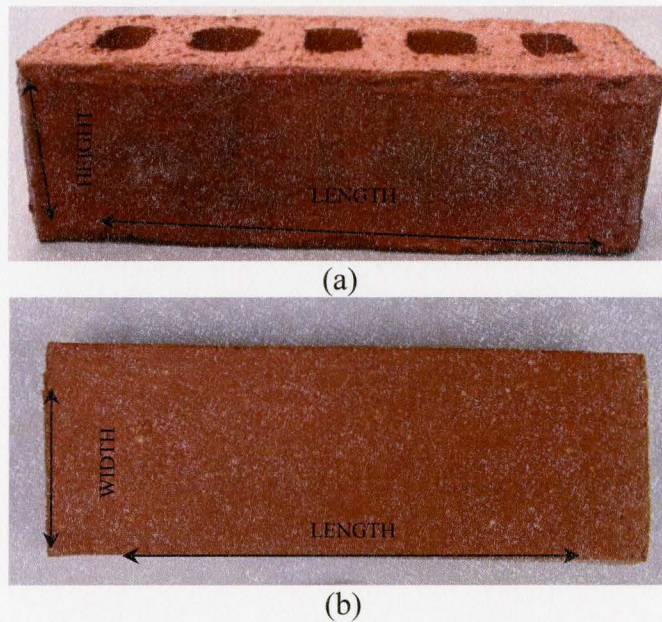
(a) Full Size Brick Testing Face (half brick) (b) Small Scale Brick Testing Face (full brick)
